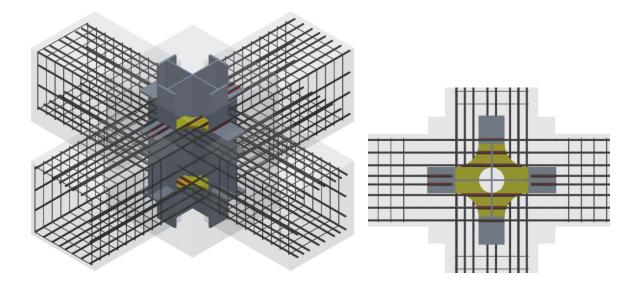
Moment connection between concrete beam and concrete encased steel column with bi-directional reinforcements on different sides of internal diaphragm plate and flange of steel corbel
